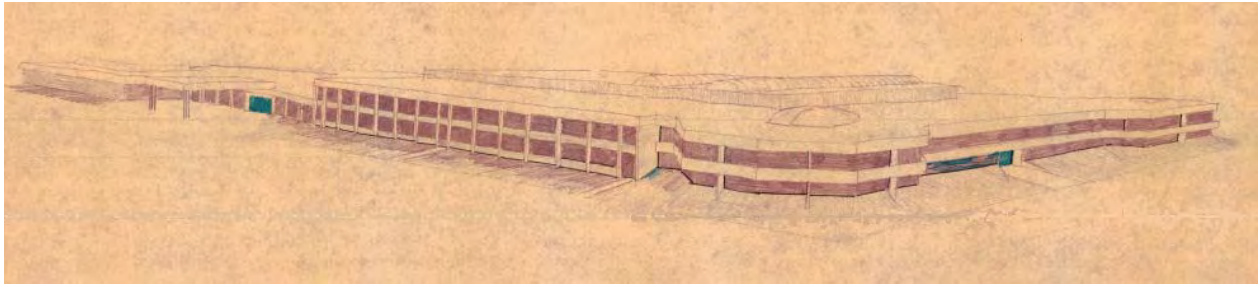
A sketch of the Figure 8-23 plan, looking northwest
